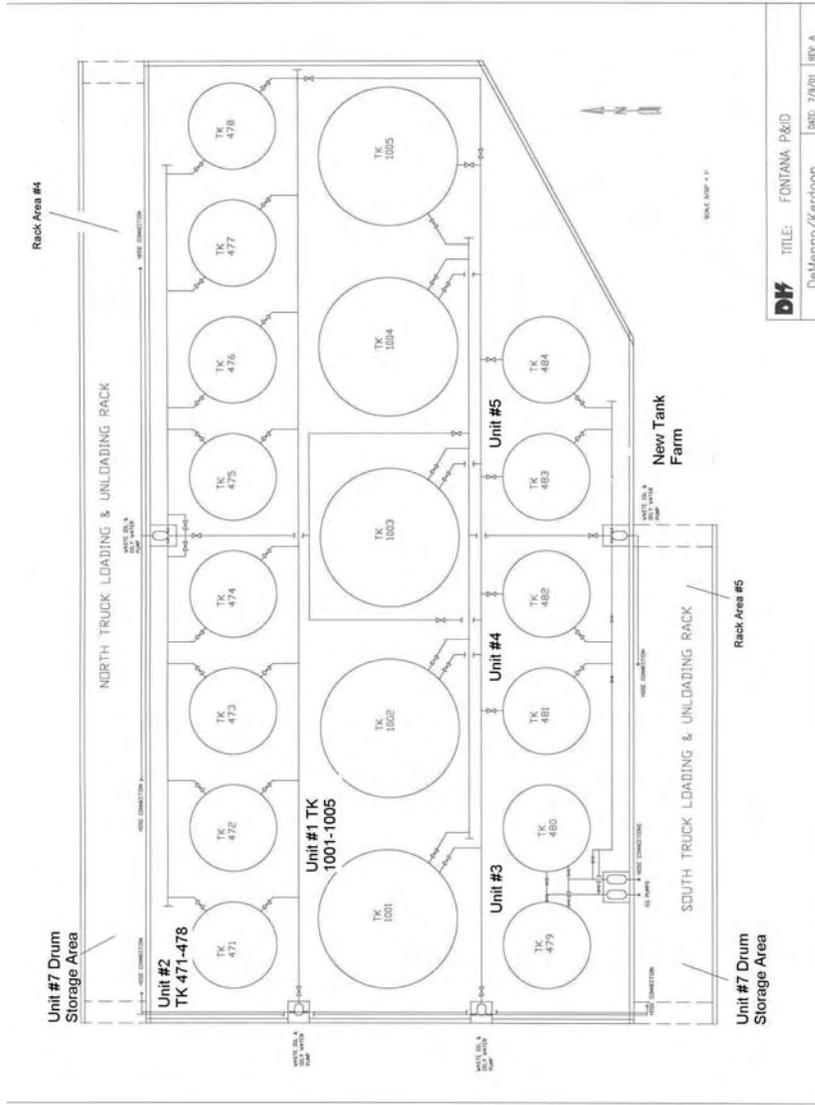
Detailed Proposed Plan for New Tank Storage and Drum Storage Area
